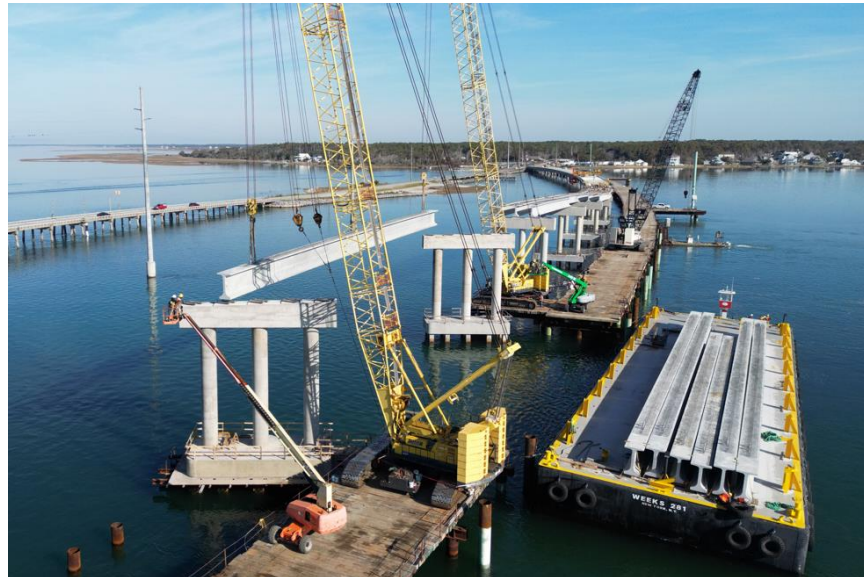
Erection of FIB girders using cranes on the work trestle
